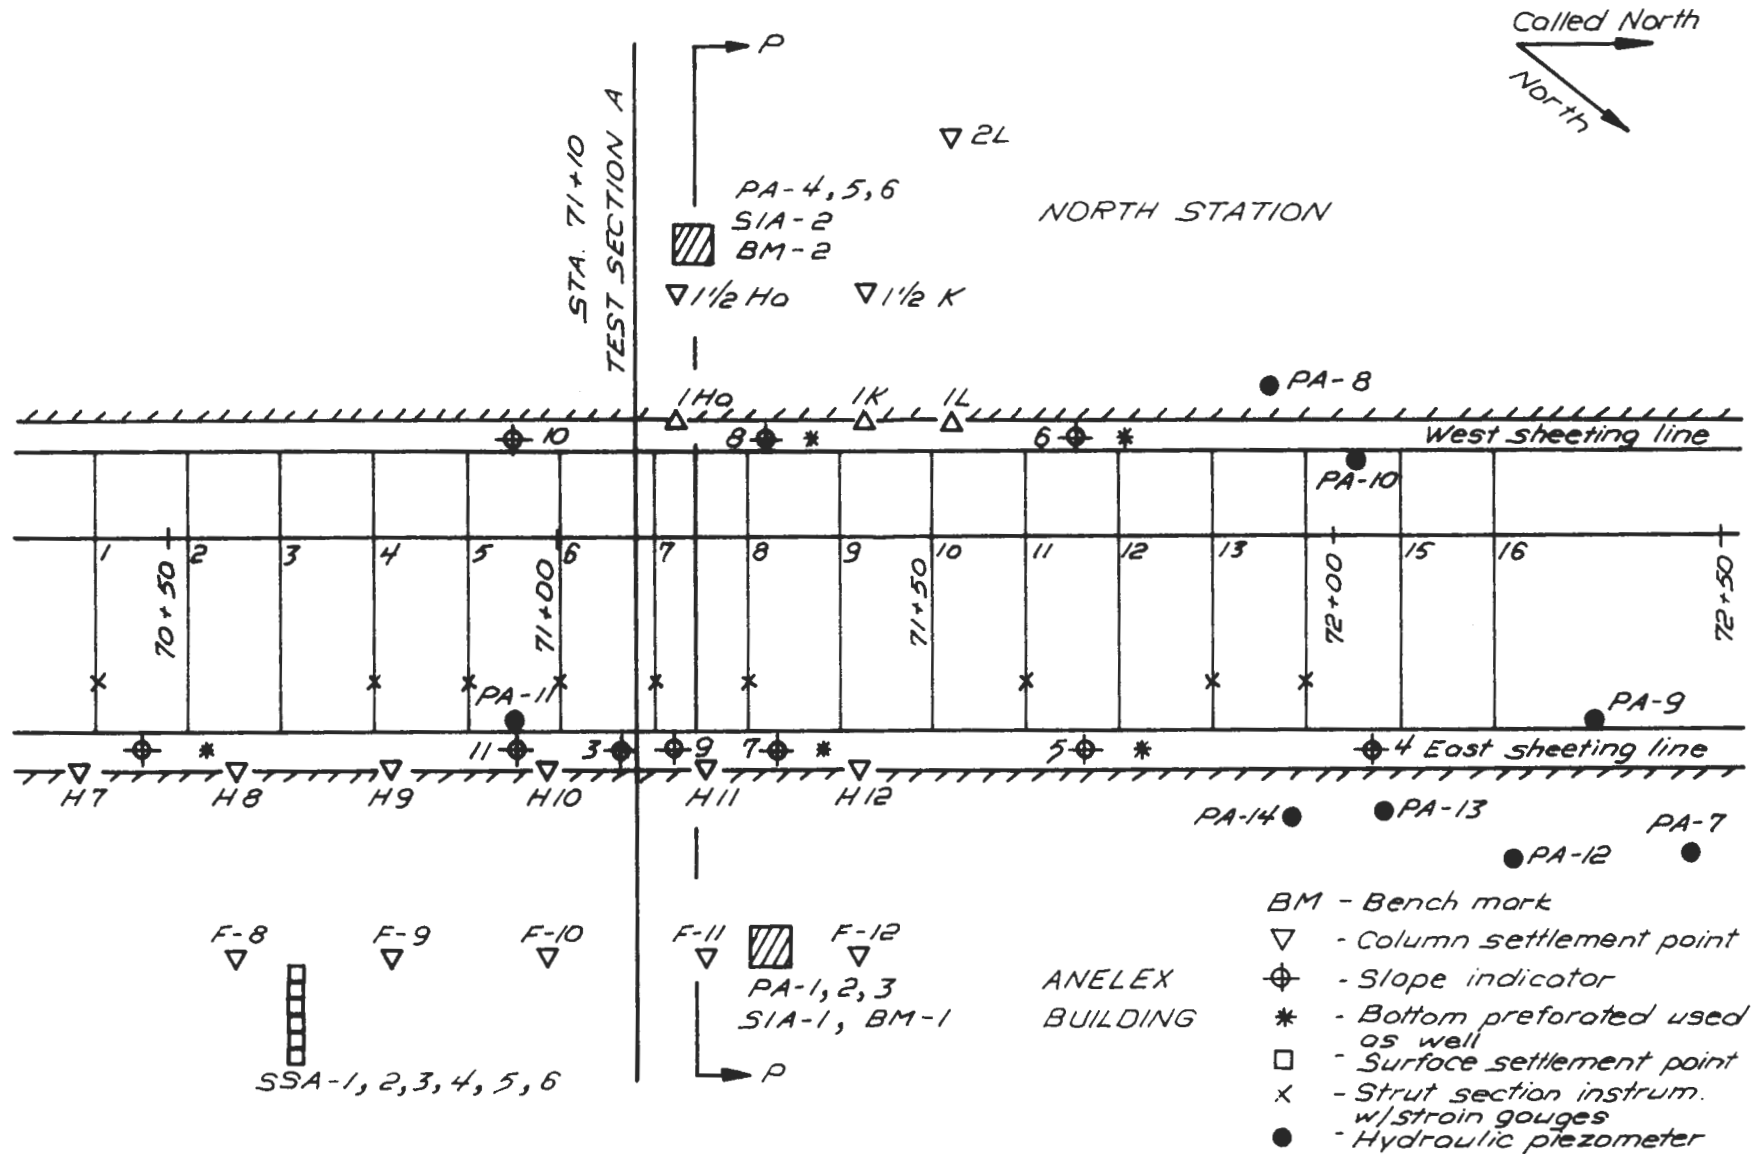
PLAN VIEW OF TEST SECTION A
